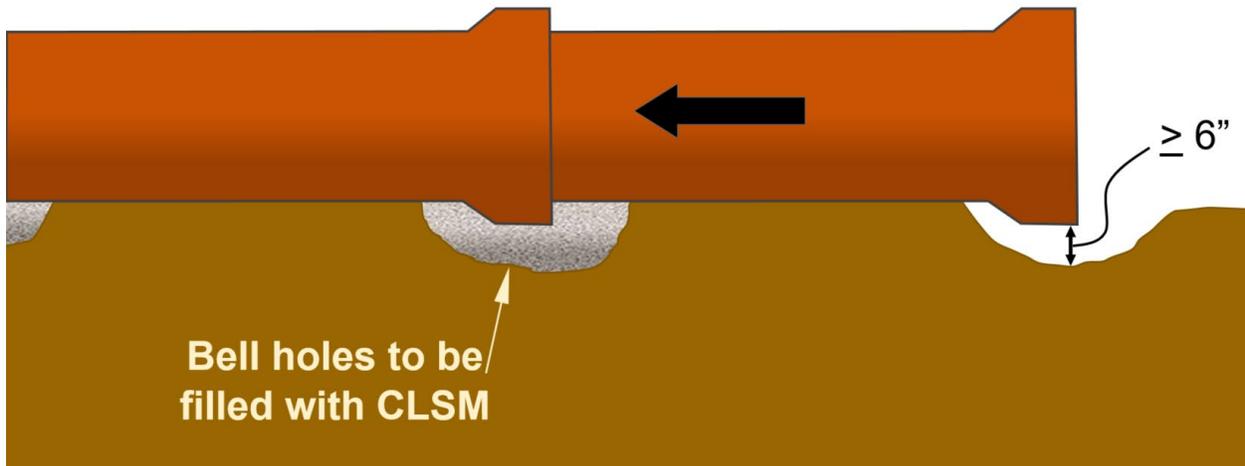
Holes prevent point-loading of the bells and allow uniform support of the barrel.
